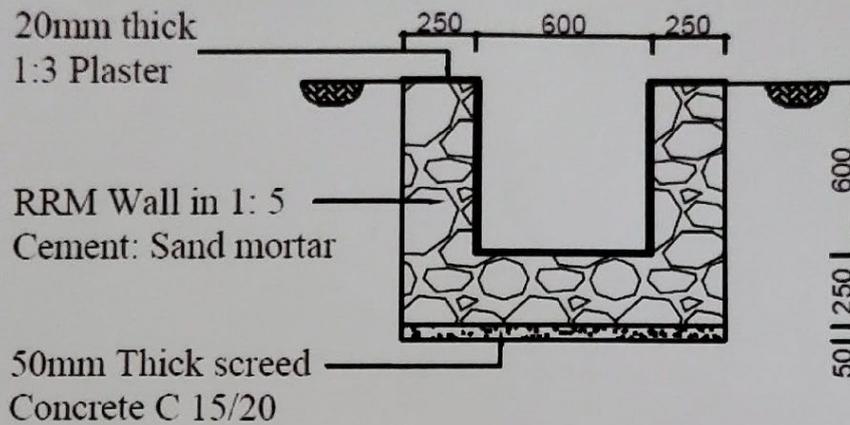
Cutoff drain location above the Adit and typical 0.6m×0.6m RRM drain details
